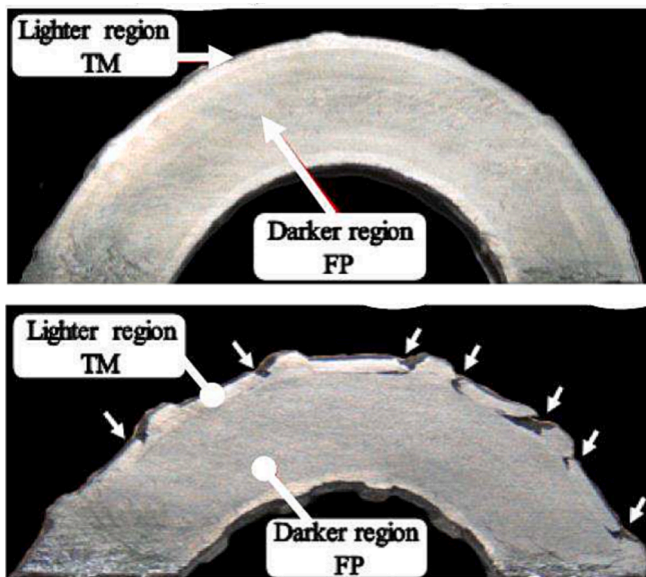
Milled section of post-bent QST rebar specimens showing (a) a good quality rebar with continuous and uncracked CSPD, and (b) a poor quality rebar showing cracks at the surface.
